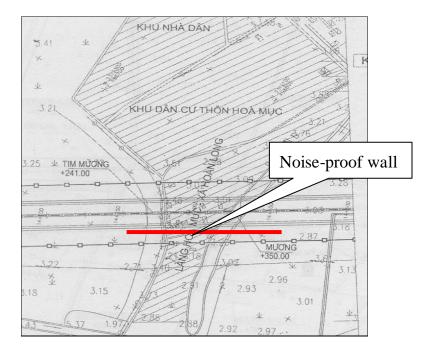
Location of noise-proof wall in the section passing through Hoa Muc village
